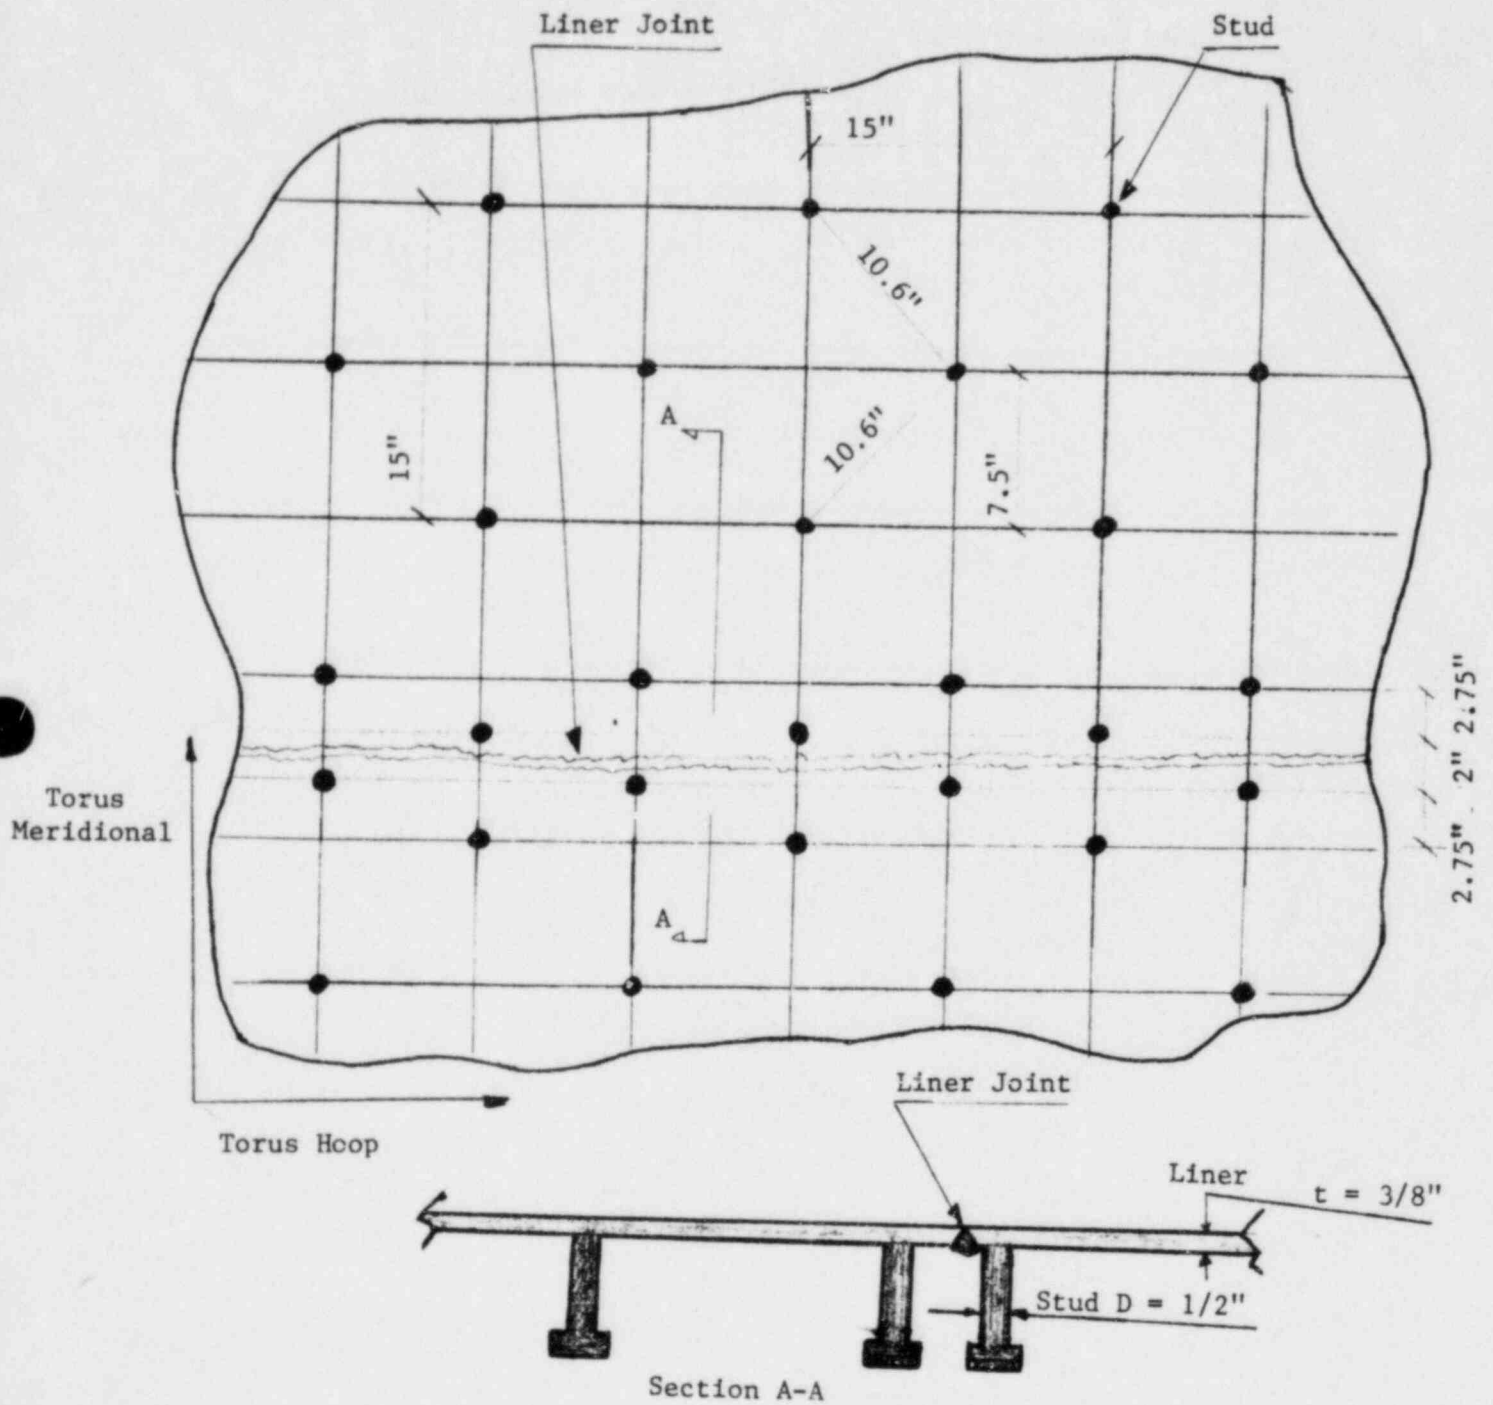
Stud Arrangement on Brunswick Torus Liner
